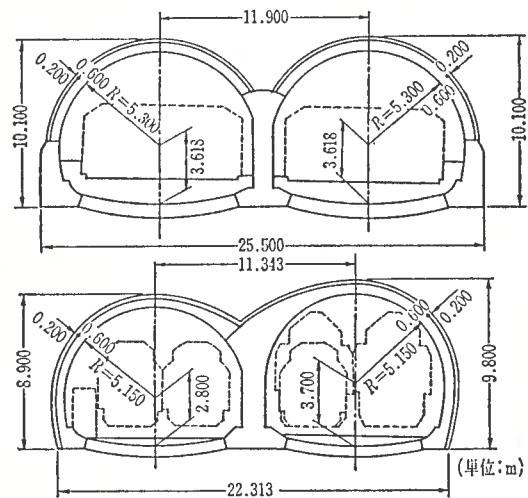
A section of Wasuzan Tunnel (Okamoto, 1988)
